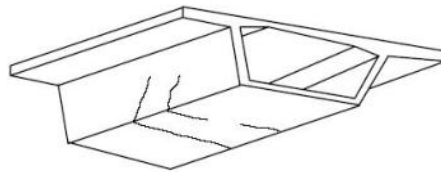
Box Girder Cracks Induced by Flexure-shear
